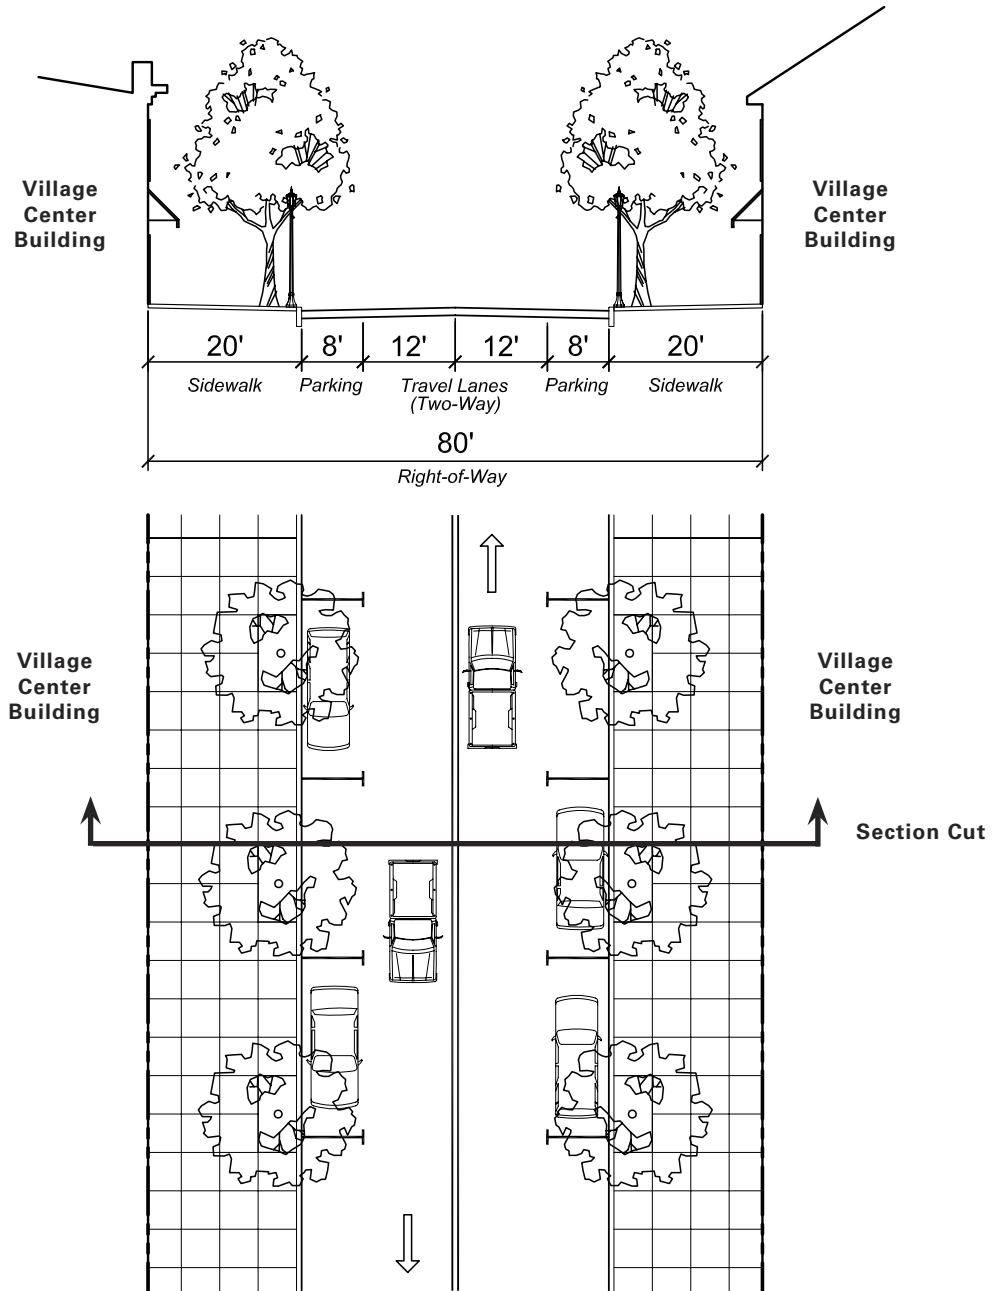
Proposed Section and Plan: Village Center Street A
